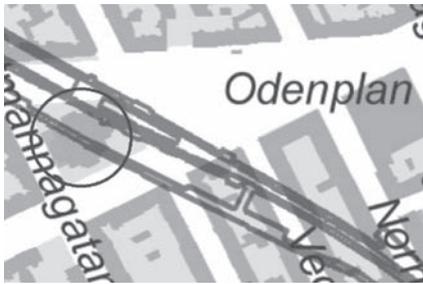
Gustav Vasa Church (encircled) above tunnel route.
